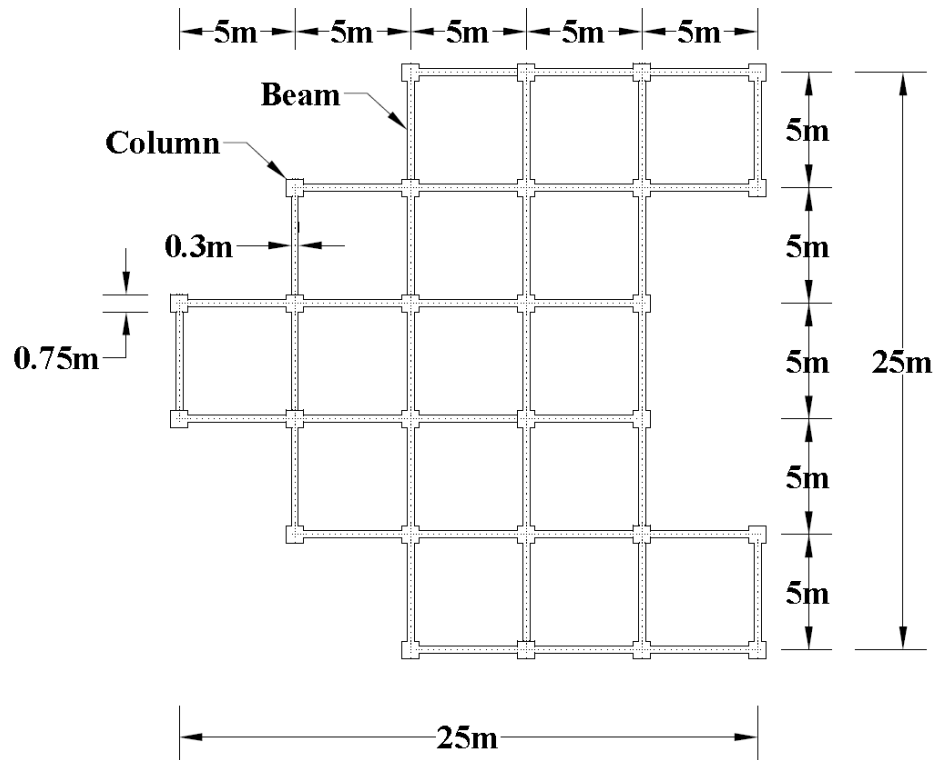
Ground floor plan of Fish Shape-2 building
